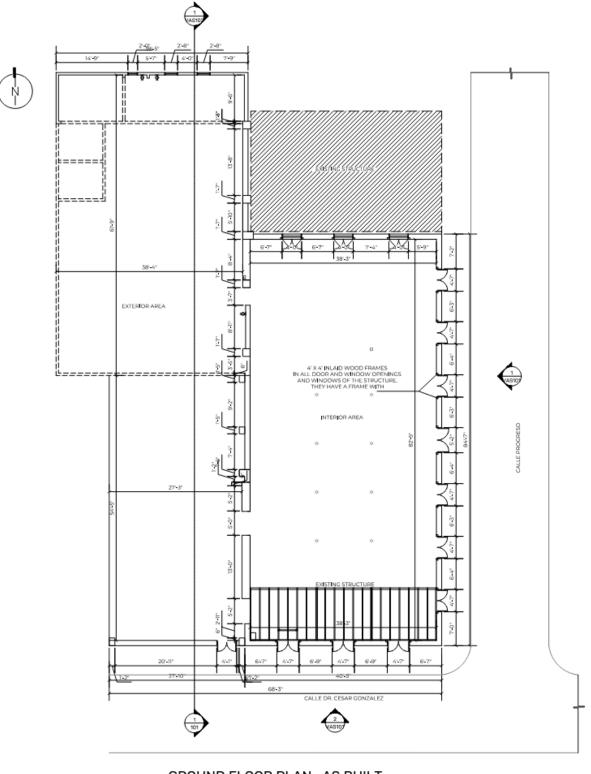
Ground Floor Plan As-Built (Ingenium Group 2023)
